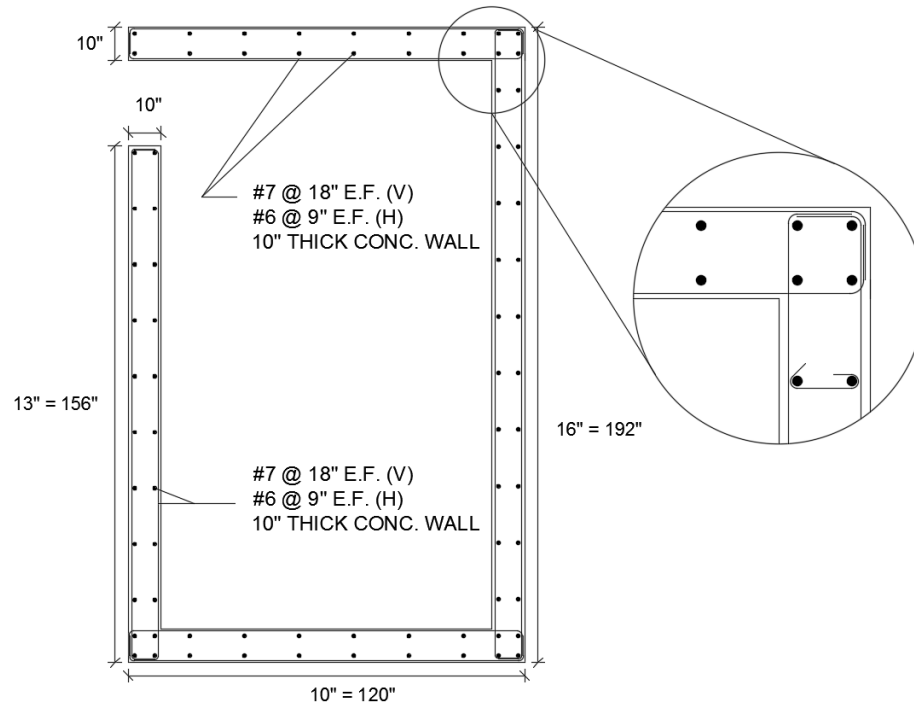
Original stairwell shear wall cross-section at the 2nd floor level
